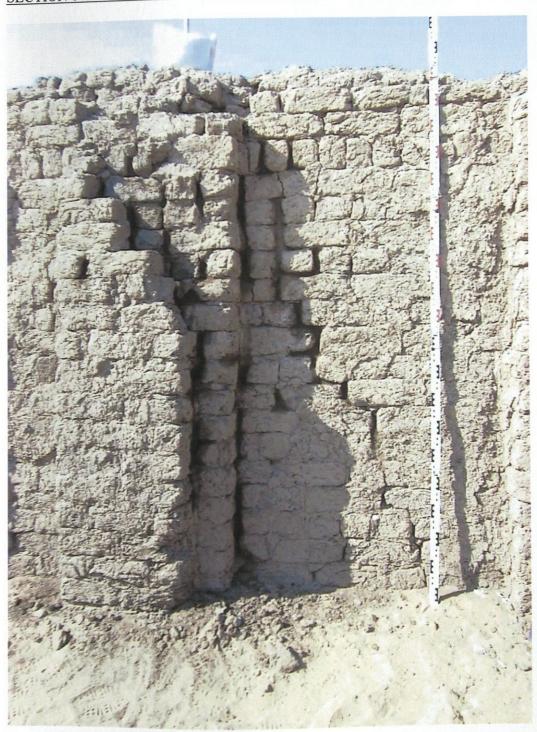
Pilaster on east elevation of East Enclosure Wall that was stabilized by repointing and grouting in March 2001. The dark mortar joints are still damp.
